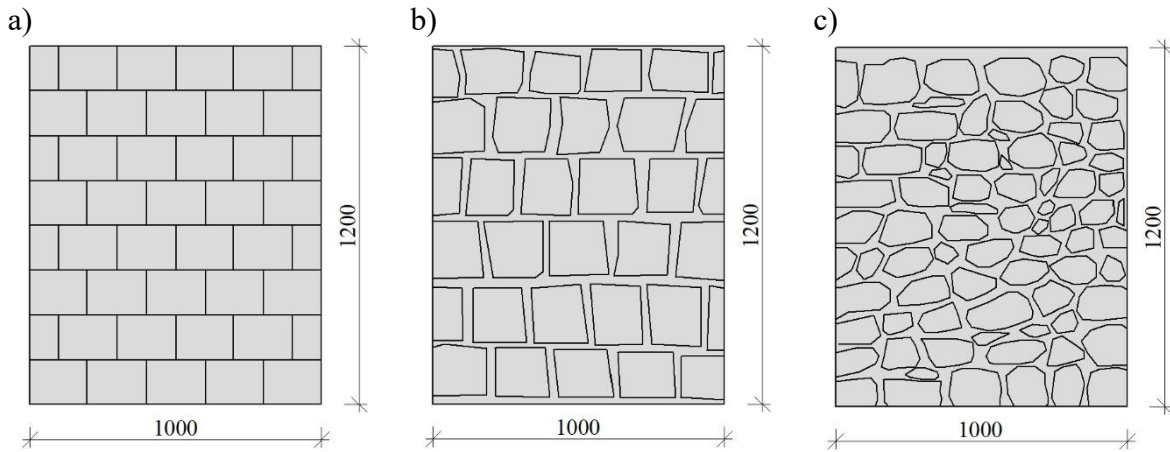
Geometry of tested walls [146, 159]: a) type I - dry stack sawn masonry, b) type II - irregular masonry with bonding mortar joints, c) type III - rubble masonry
